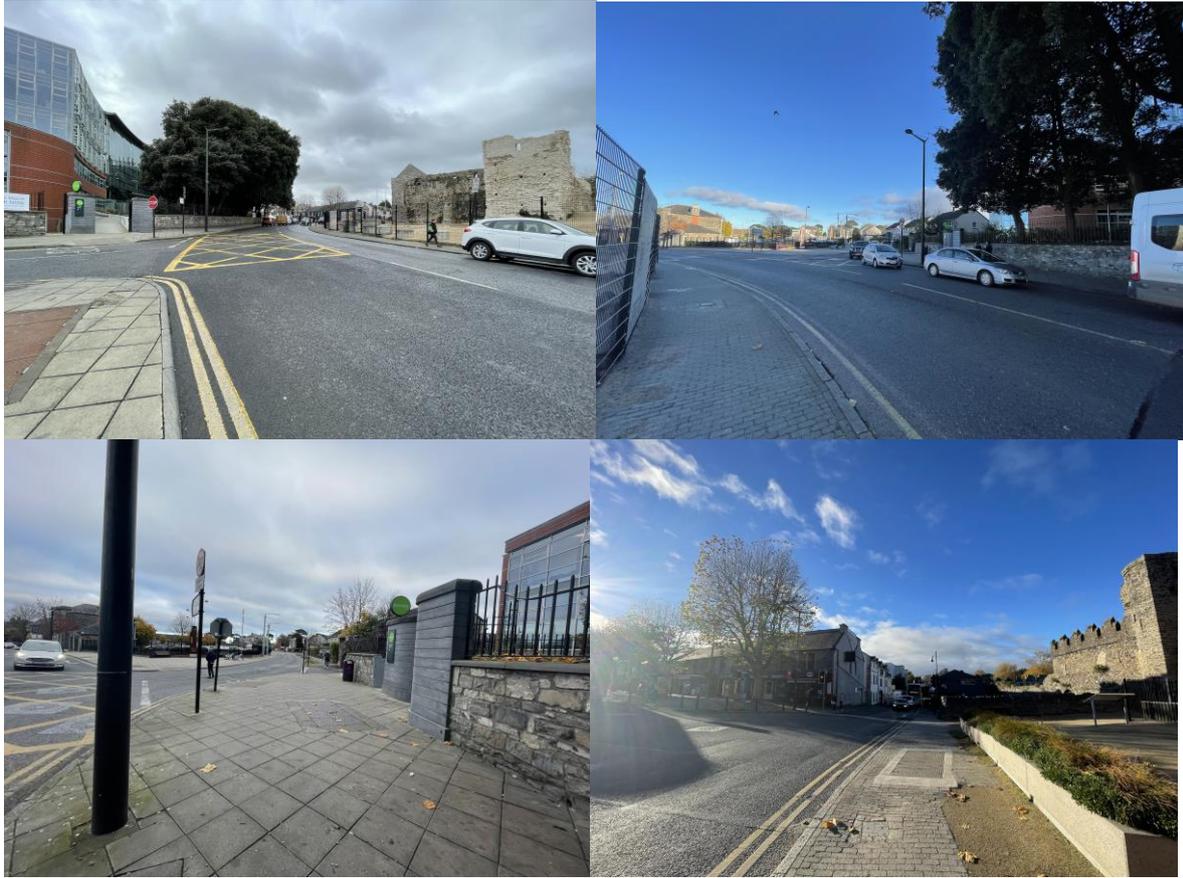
Photos of Site Extents – Bridge Street to Seatown Road
